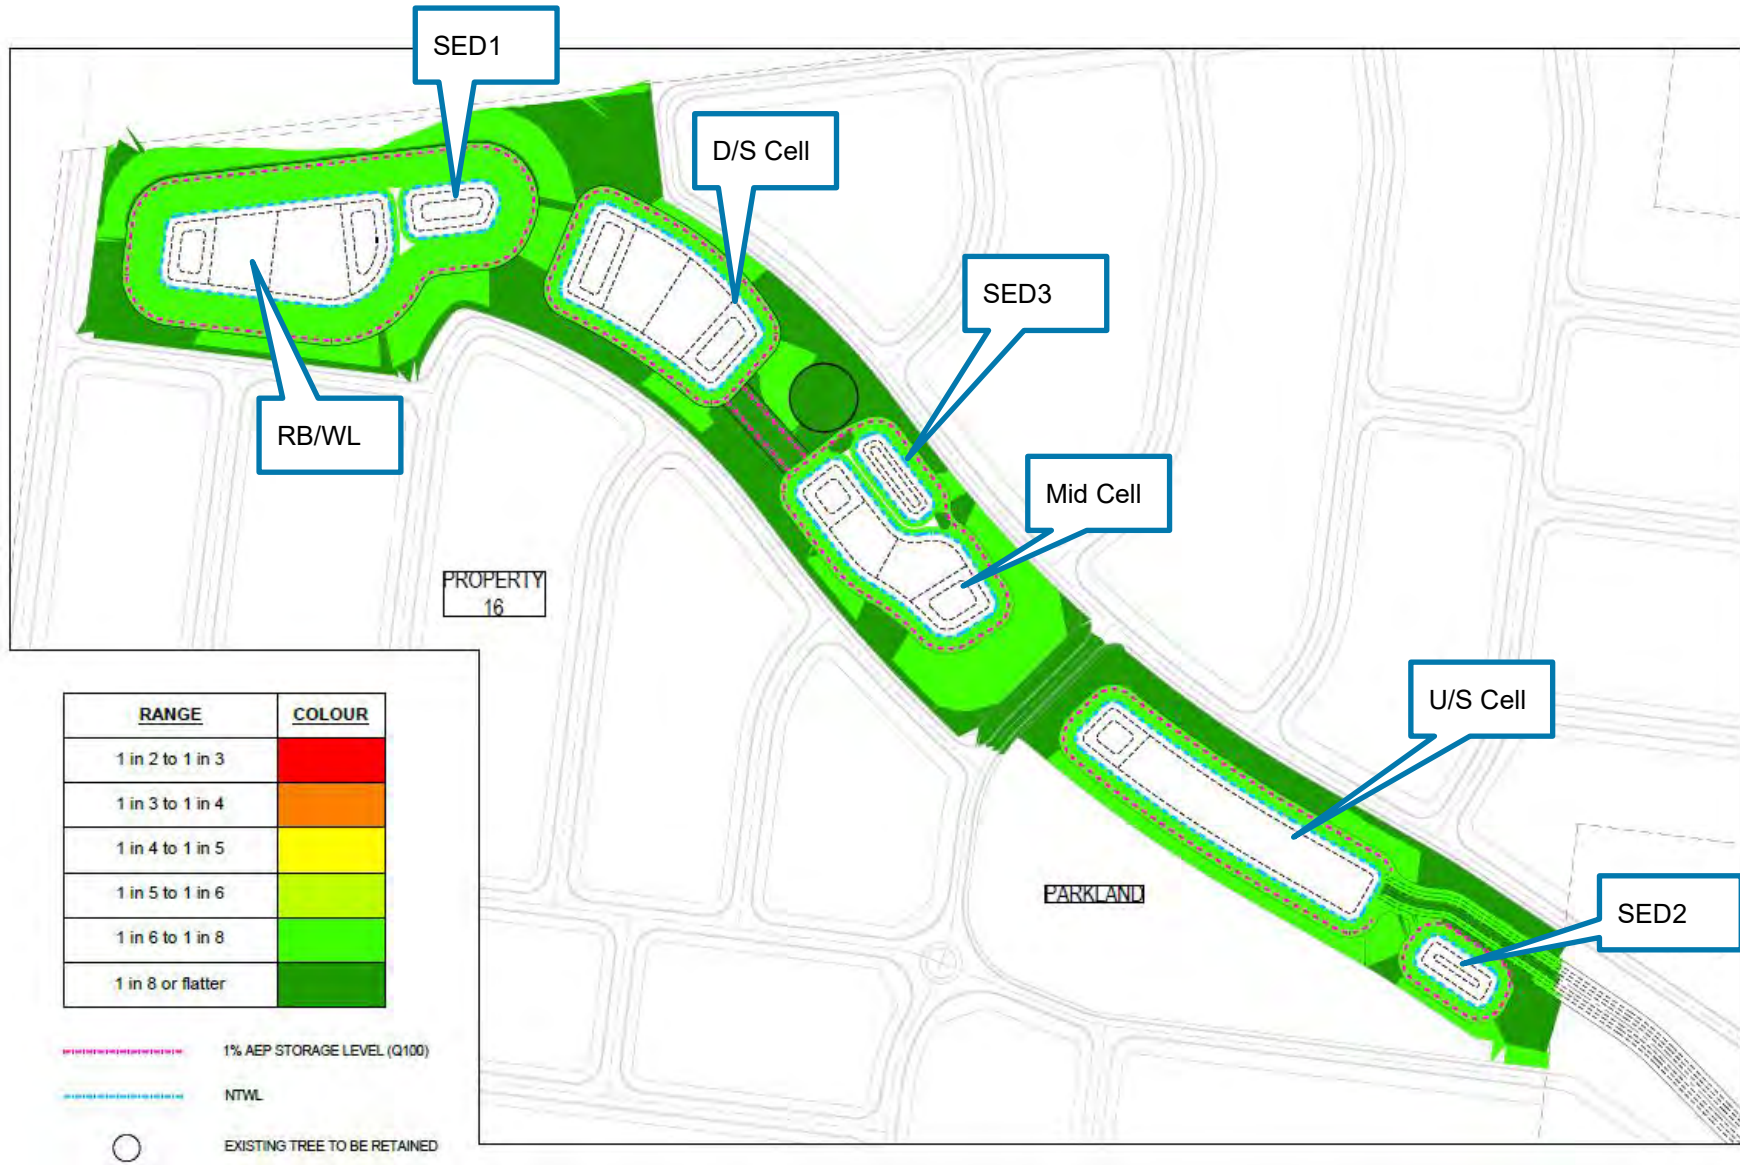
CONCEPT ASSET ARRANGEMENT SCHEMATIC (EXTRACT OF SMEC BATTER SLOPE PLAN)
